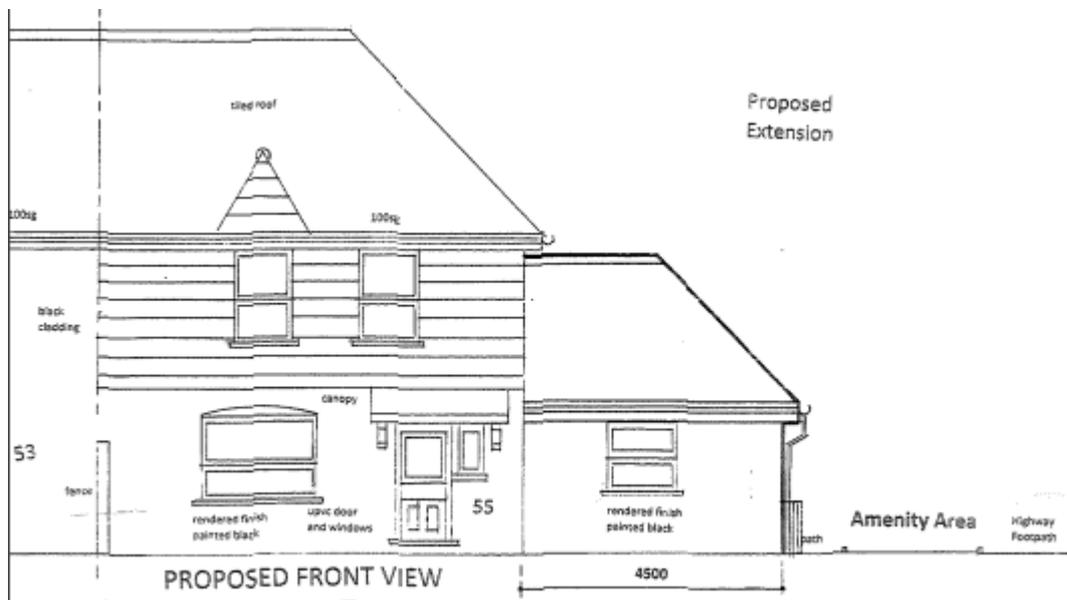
Proposed Front Elevation (Proposed and Existing Floor and Elevations)
